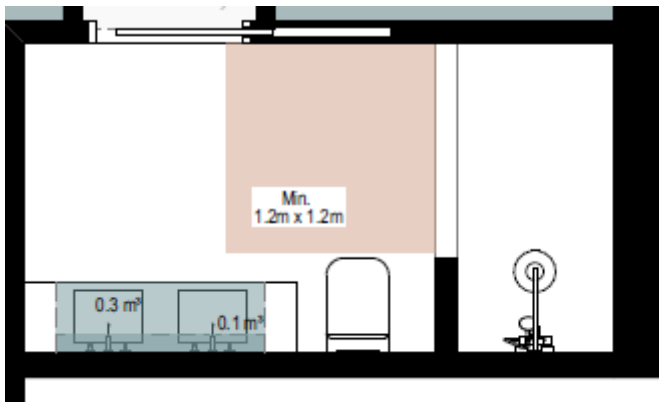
Excerpt of the accessible bathroom from apartment Type 3 – Decision Plans
